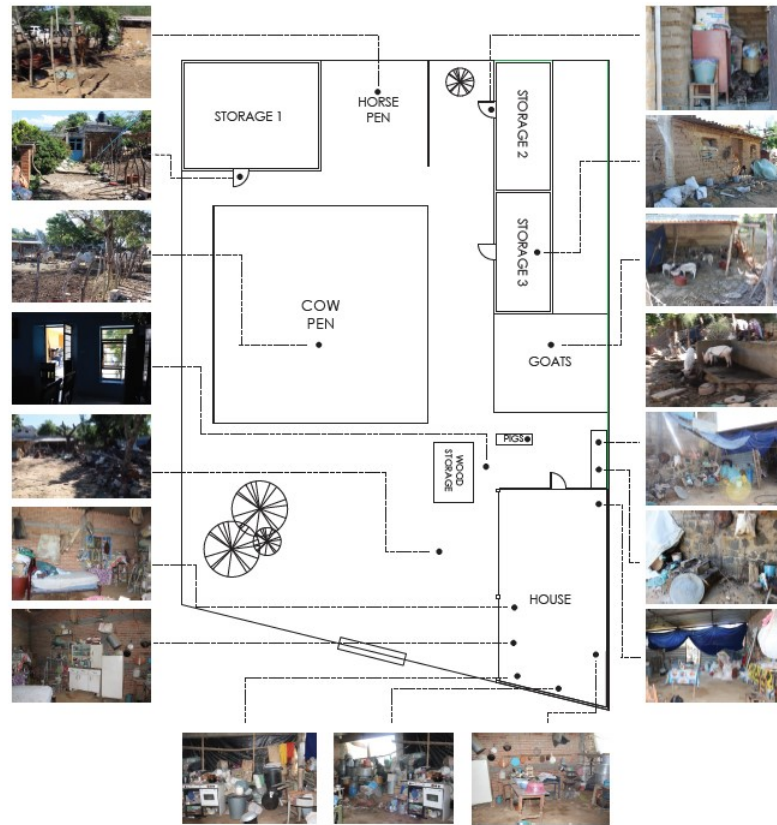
Example of Lot and Photos Plans in Appendix 4 Case 3a & 3c. María Carmen's house. Note dirt floors, and flimsy building materials.
